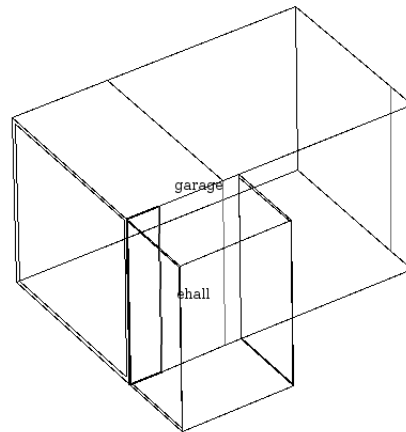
The Hall has three doors, to the Garage, Family Room and External Environment. The Garage has a large window opening representing double glazed French doors.
